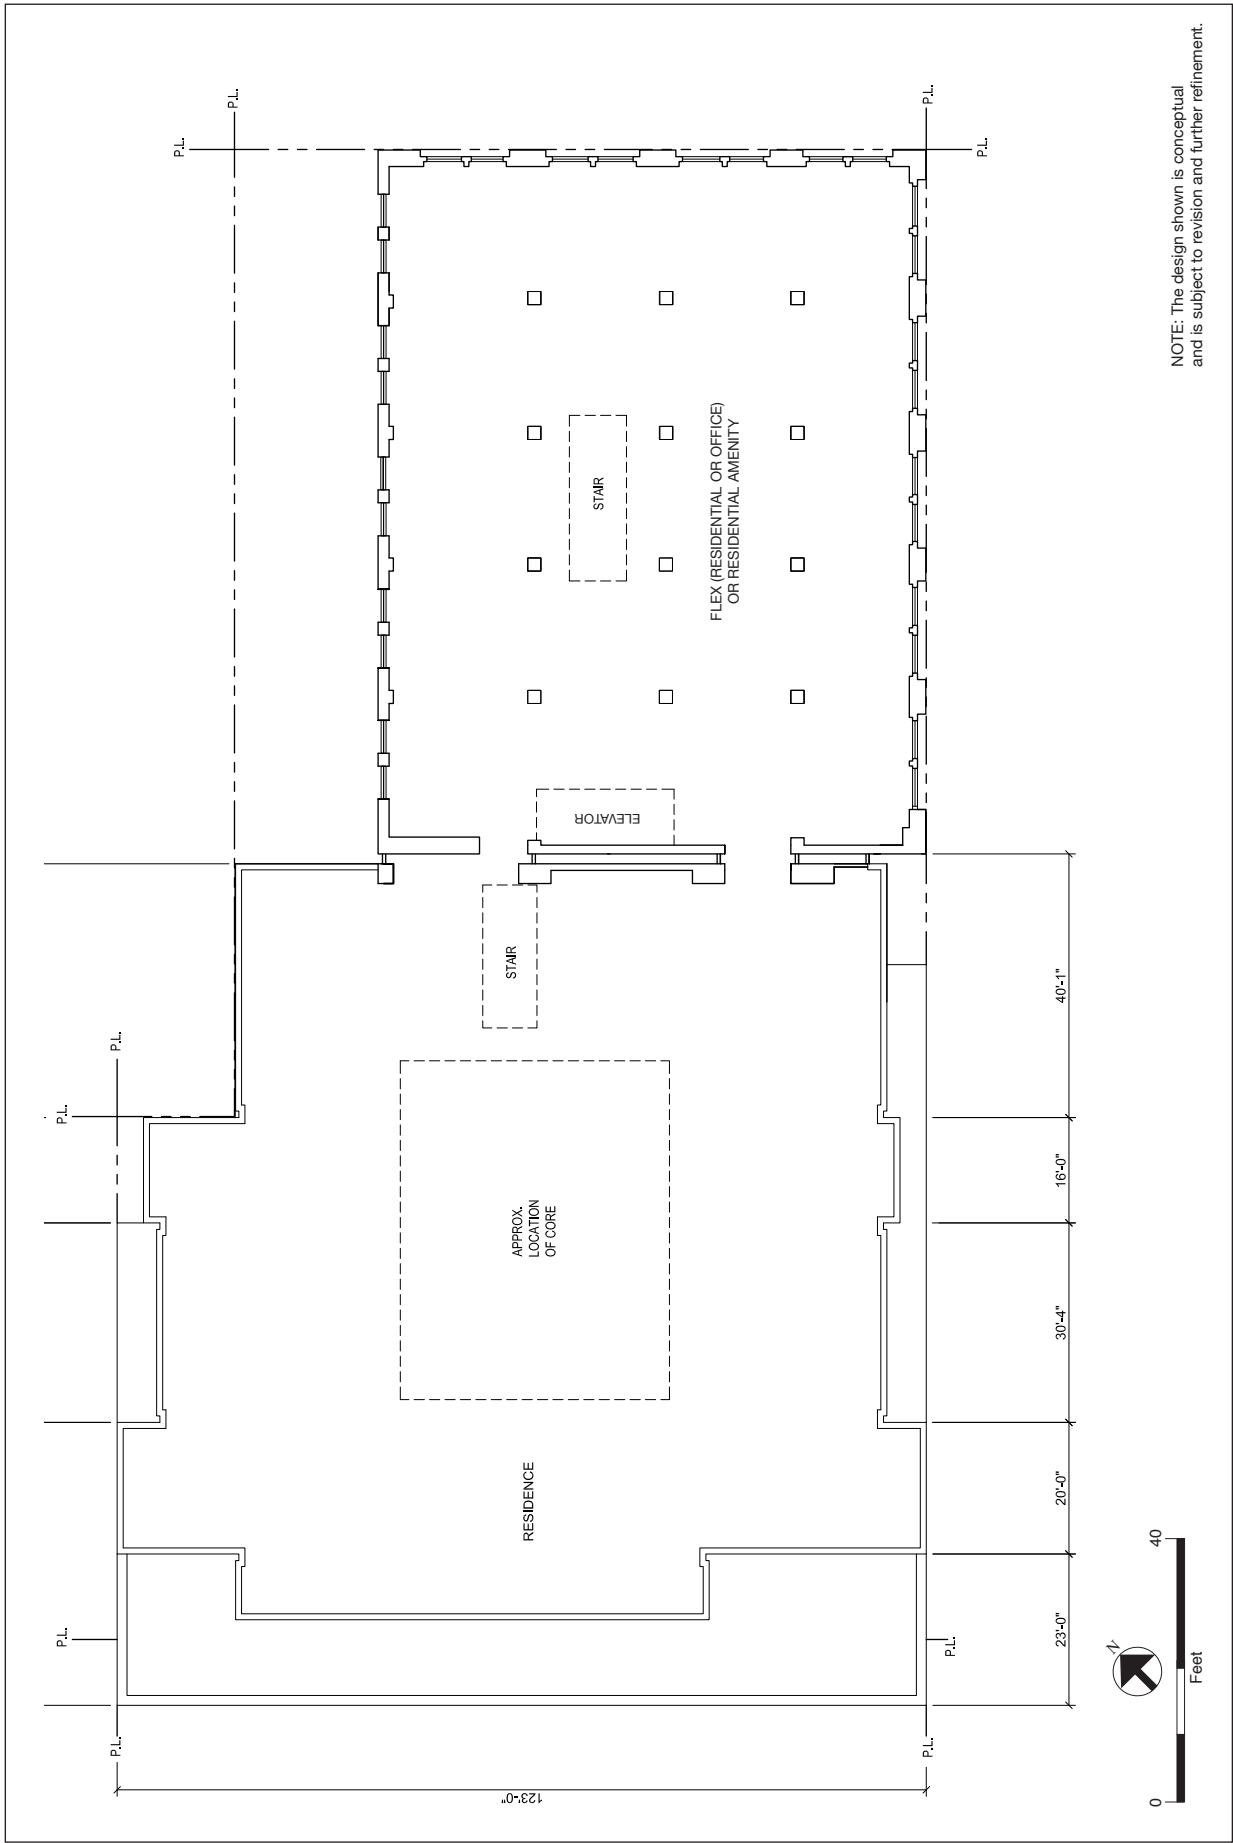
CONCEPTUAL FLOOR FOR FLOORS 10 THROUGH 12 - TOWER, CONCEPTUAL FLOOR 10 - ARONSON BUILDING
